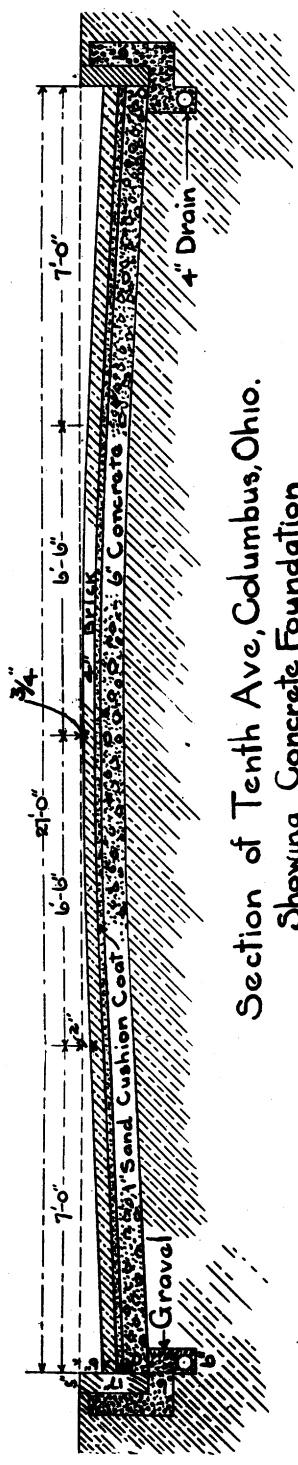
shows a section of Tenth avenue, Columbus, Ohio, which is paved with brick block upon a concrete foundation. This concrete foundation costs from 70 to 75 cents per square yard. The labor of mixing and laying the concrete cost on an average 15 cents per square yard.
